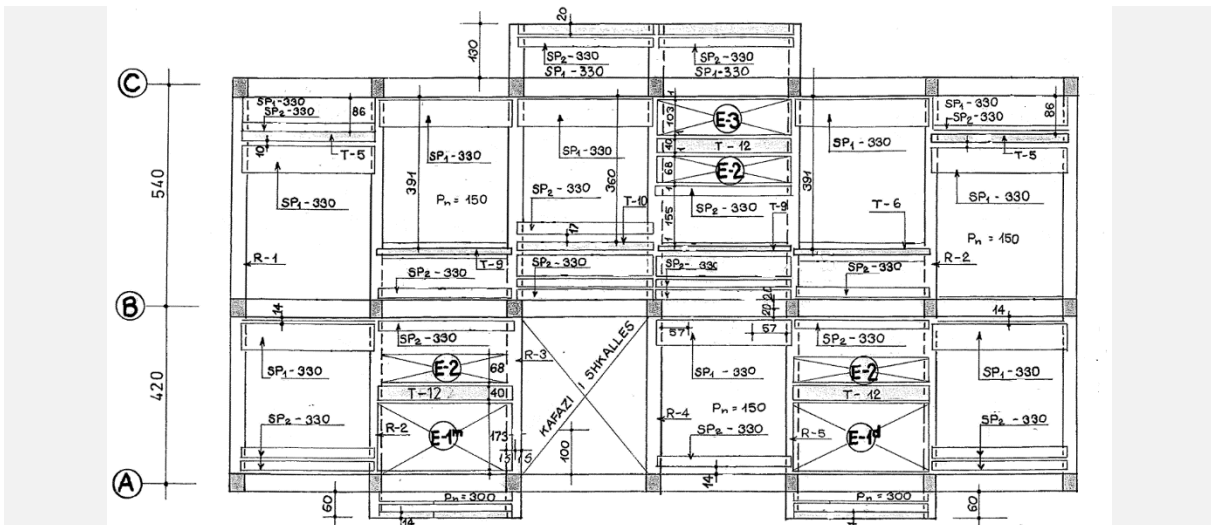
Structural layout of original RC 82/2 Model (AQTN)
